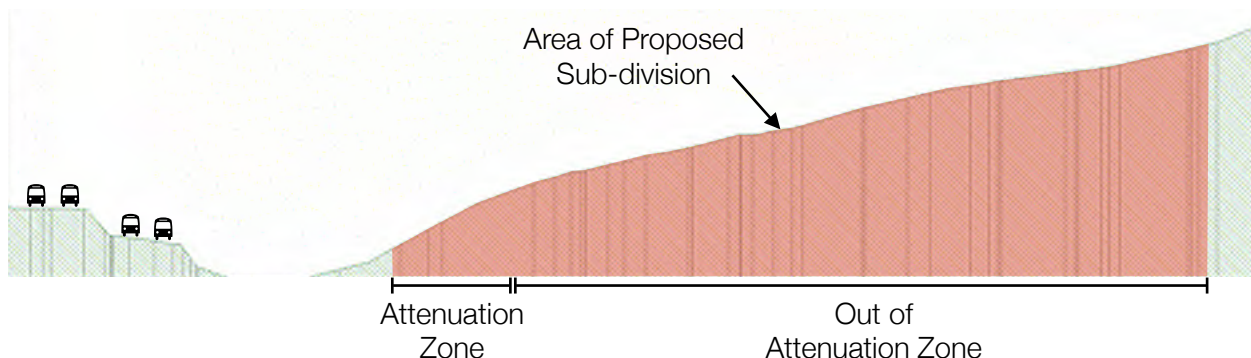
CROSS-SECTION OF SITE - VIEWED FROM NORTH-WEST
